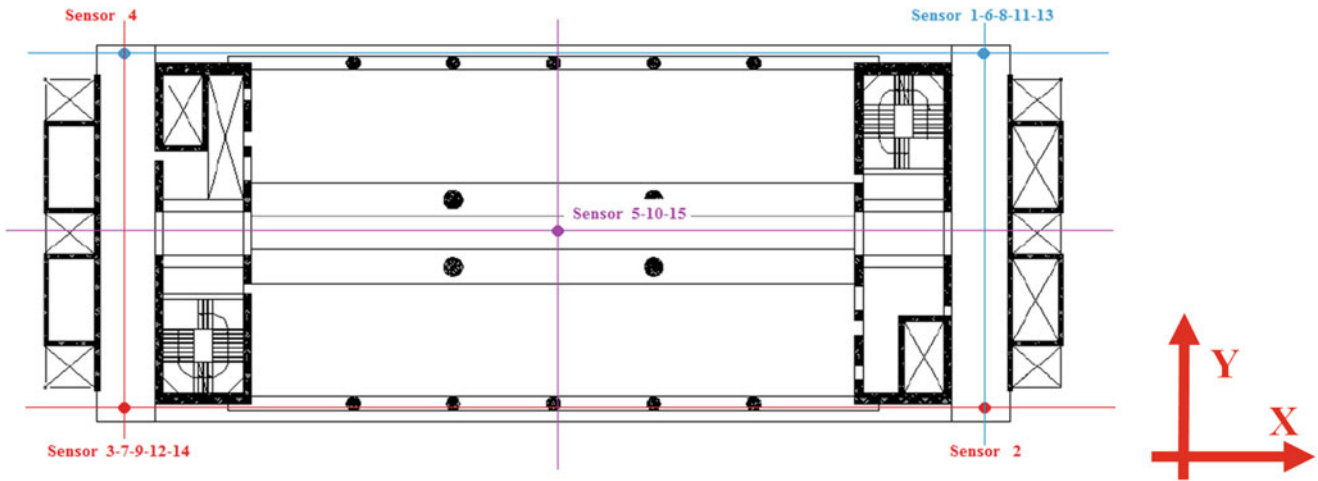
Test set-up: location of the sensors on the typical instrumented floor
